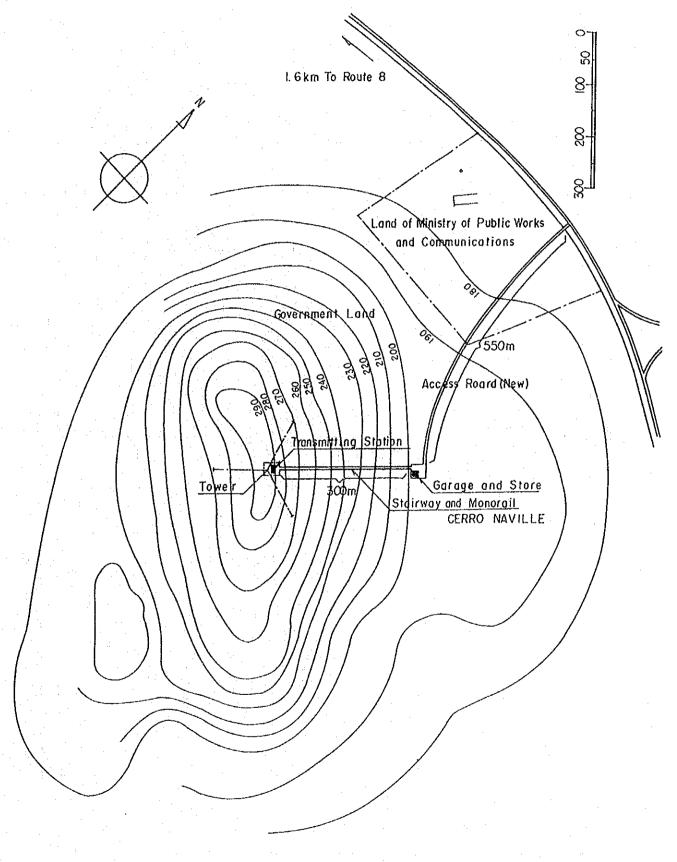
Layout Plan of Broadcasting Station in Villarrica. CERRO NAVILLE 5.5<u>00 8.00</u>0 NEW TOWER H=150m STAIRWAY 290 NEW TRANSMITTING STATION 30 8 III-3-34
